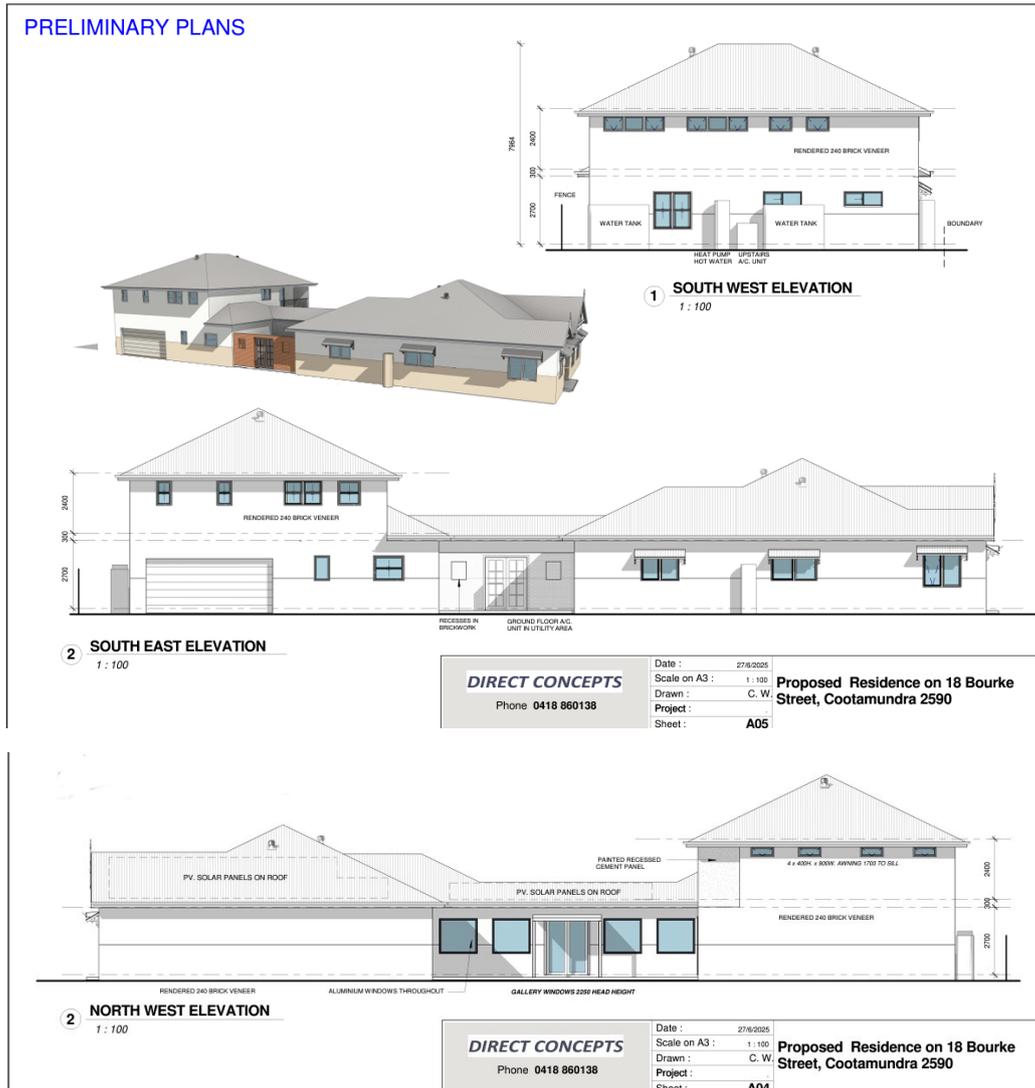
Proposed Plan for New Dwelling (Source: Direct Concepts, 2025) [not to scale].
